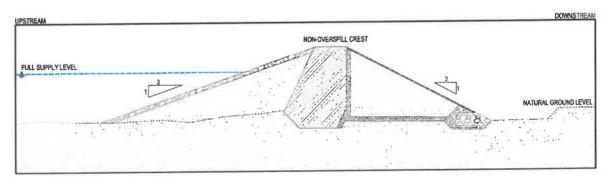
Cross section of the intended dam wall design (DWS. 2020)
